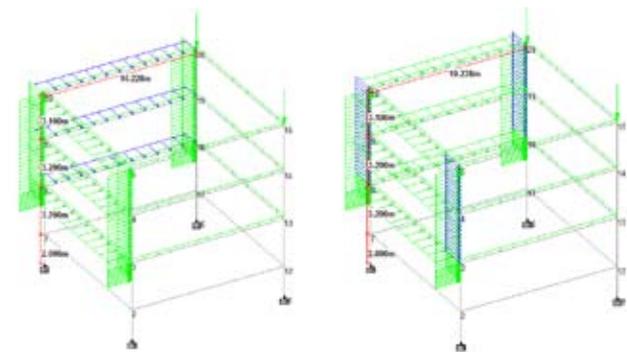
Horizontal loads on beams and pedestals in diagonal direction
